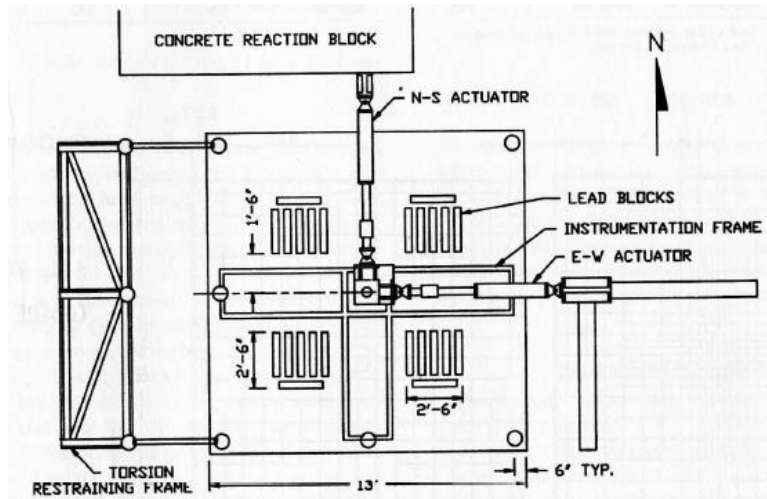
(a)—Test setup: Plan (1 in. = 25.4 mm)
